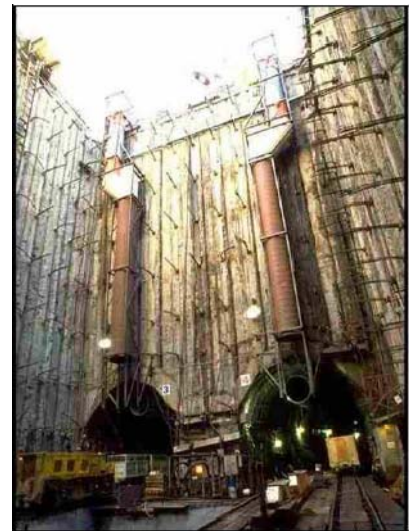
Secant Pile Wall Used at the Barnsdall Park Shaft
